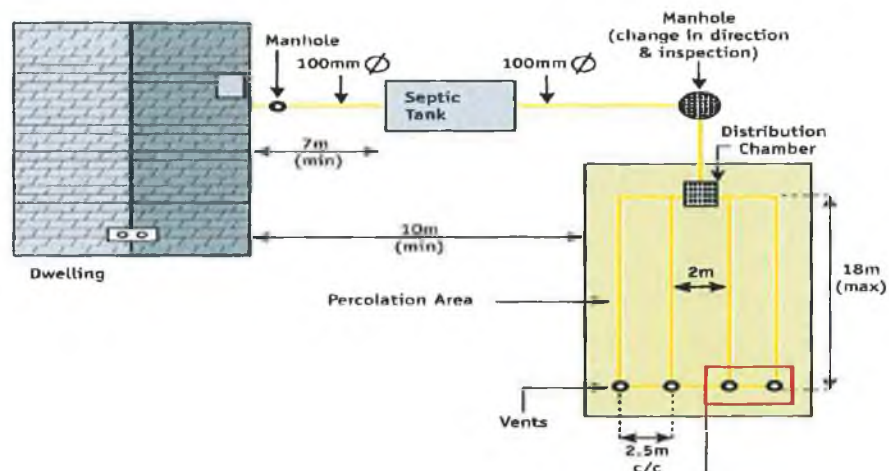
Layout of Septic Tank system (EPA, 2009)
